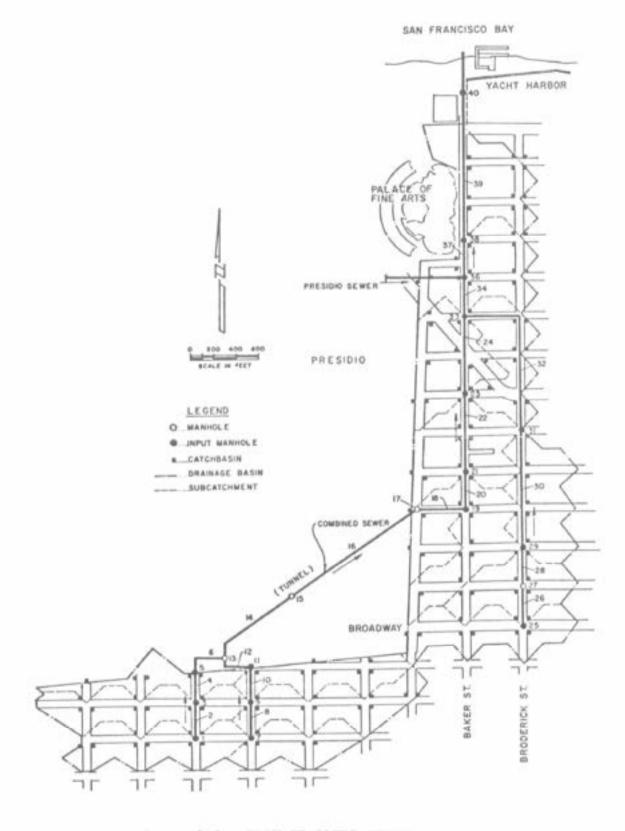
PLAN OF BAKER STREET SYSTEM
